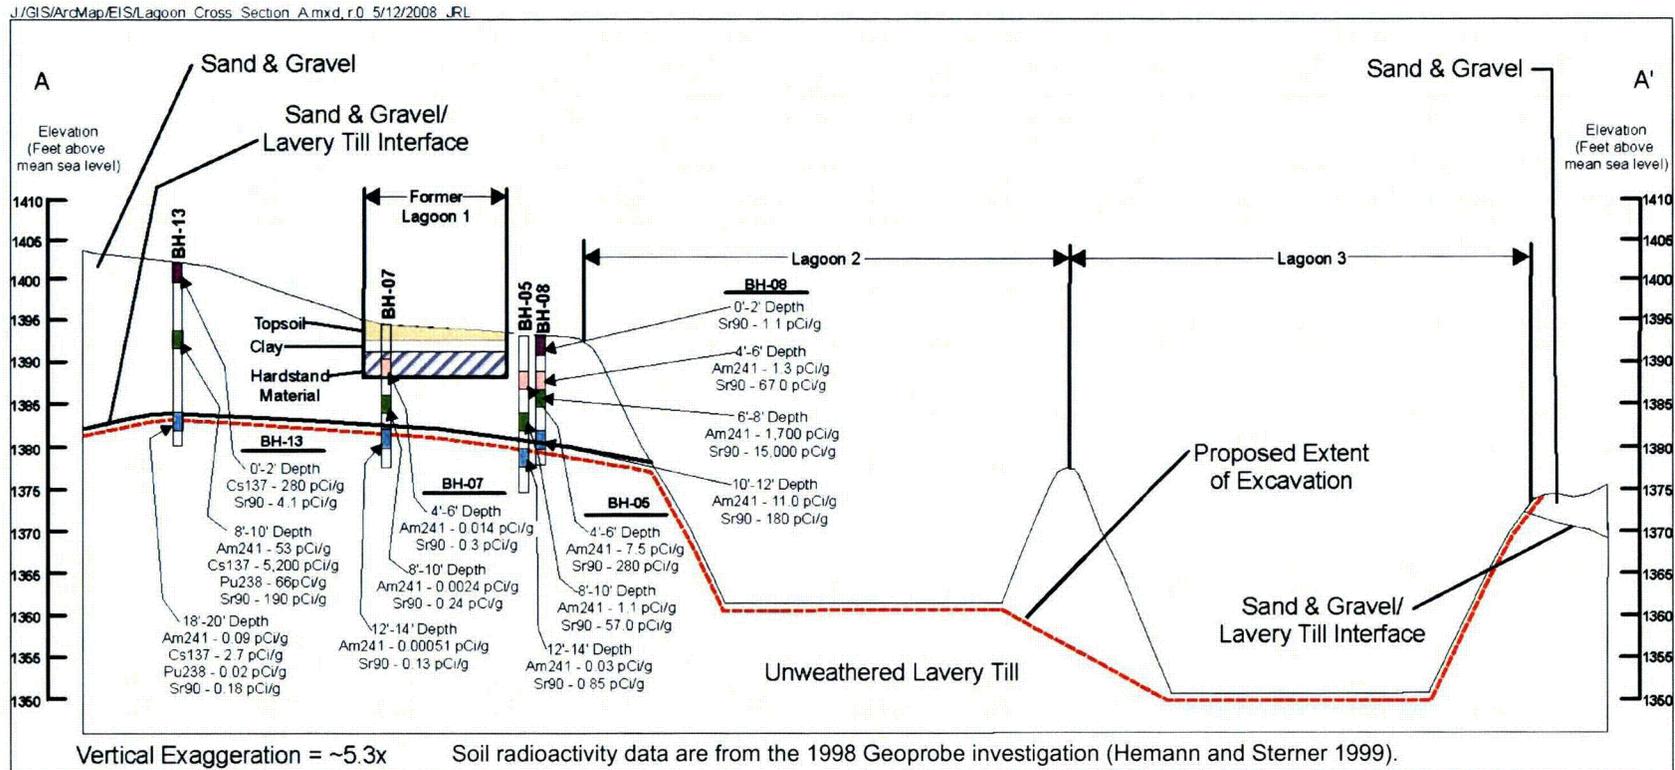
Conceptual Arrangement of WMA 2 Excavation, Cross Section
